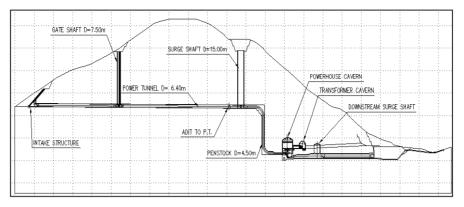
Longitudinal Section of Pressure Tunnel, shafts, Powerhouse and Tailrace tunnel of Toe option of Dudhkoshi storage Hydroelectric Project.
